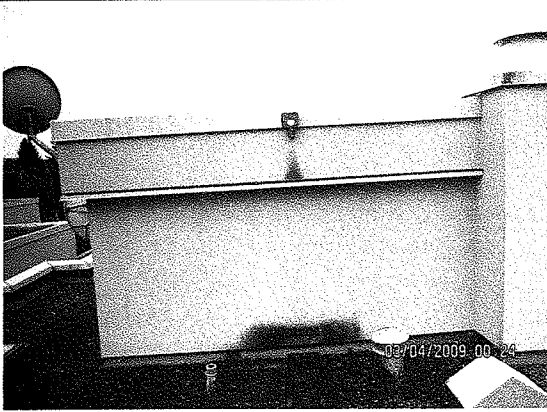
There should be a downpipe installed at the elevator roofs, so that rain water does not run down the stucco finish, or splash onto the lower roof and up against the stucco wall.
